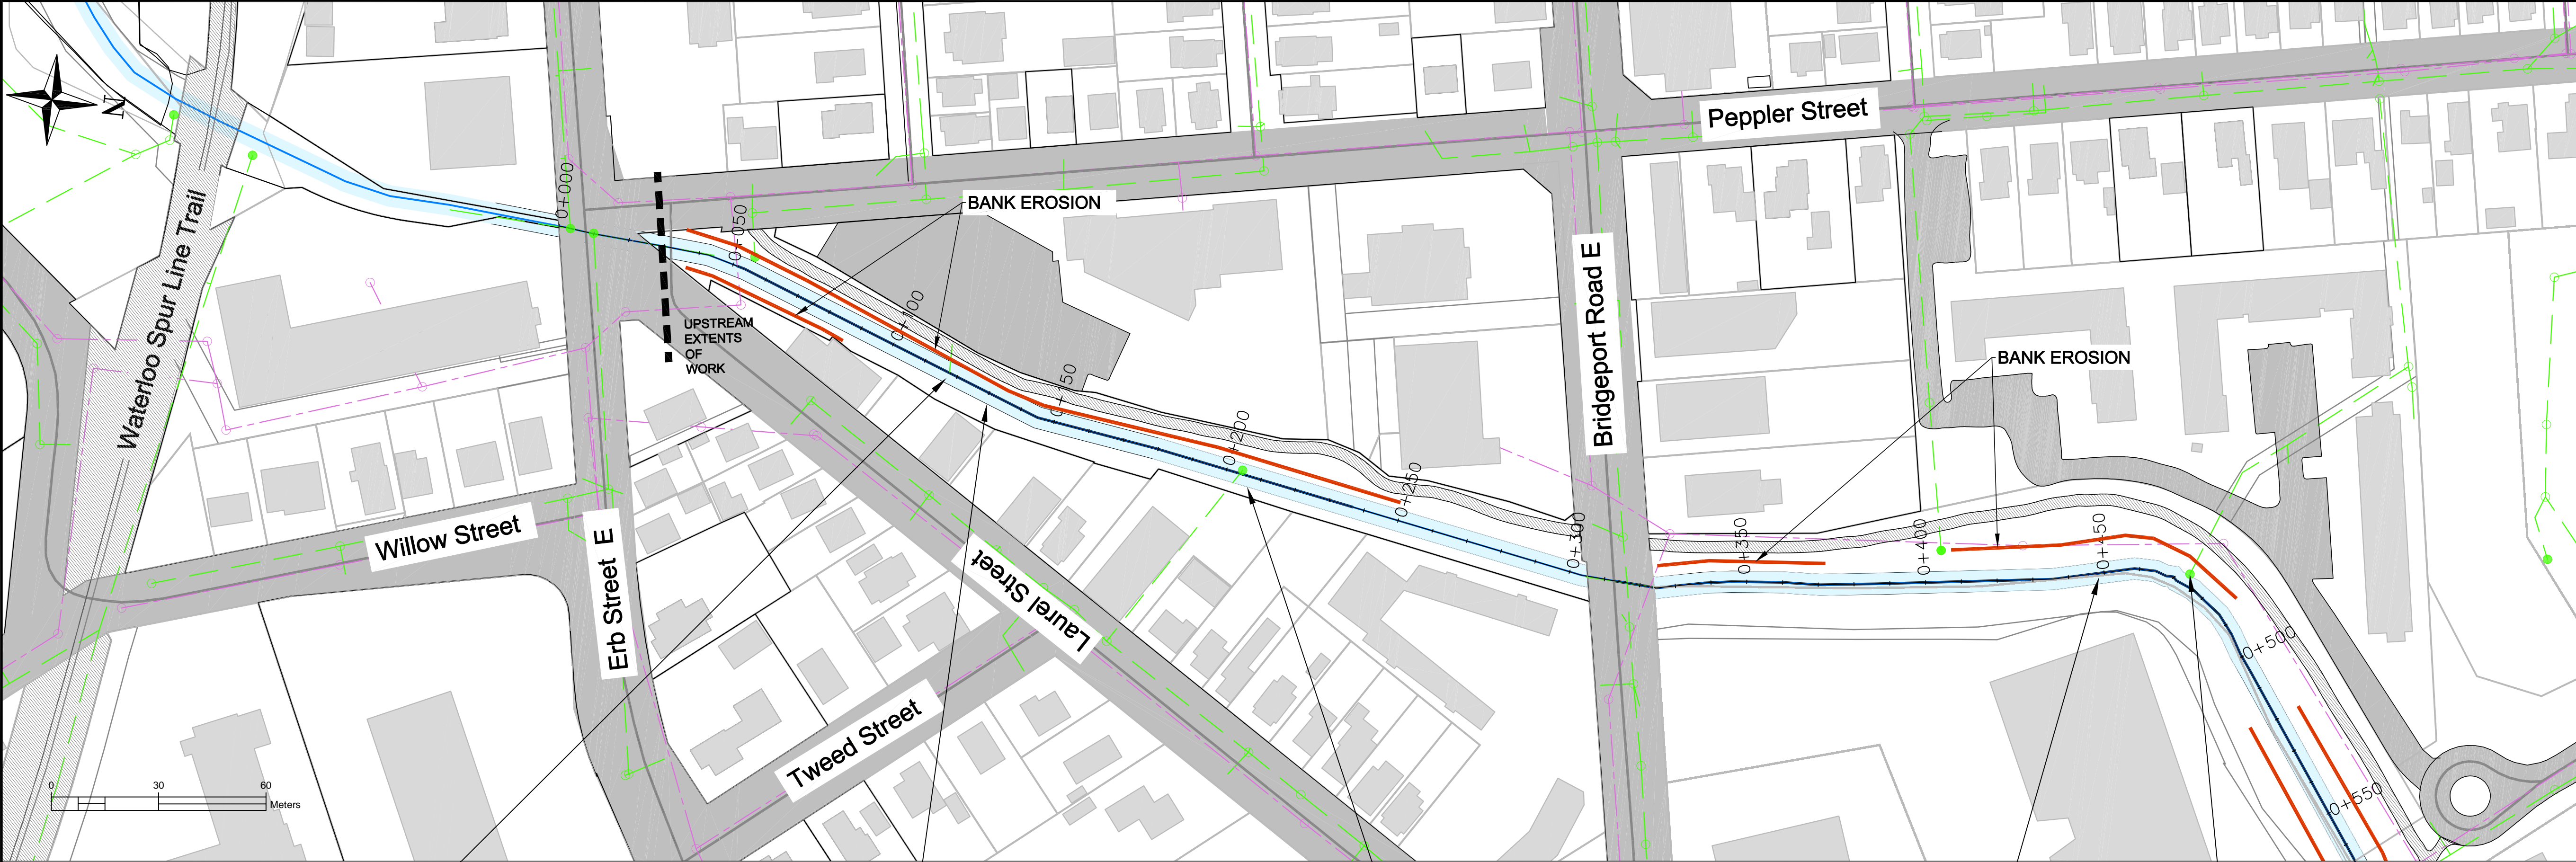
SITE SPECIFIC CONSIDERATIONS
